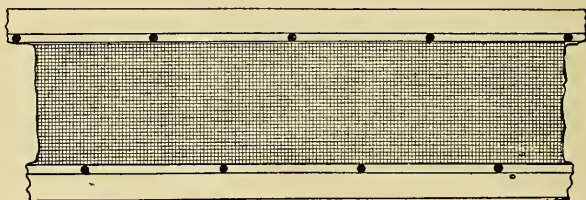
Narrow avenue, showing trees planted alternately about 45 feet apart.
